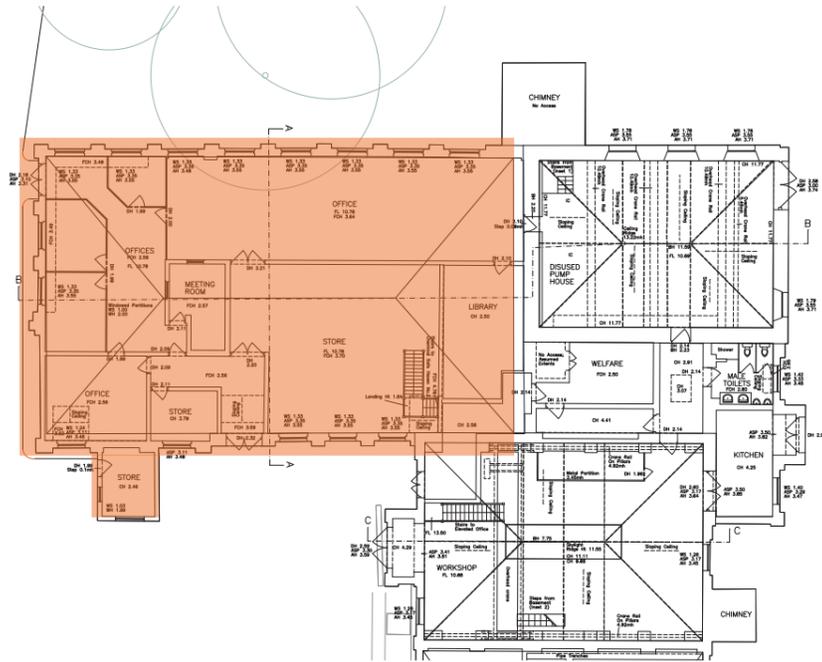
Location Plan: Ruston & Ward Building, former boiler house
